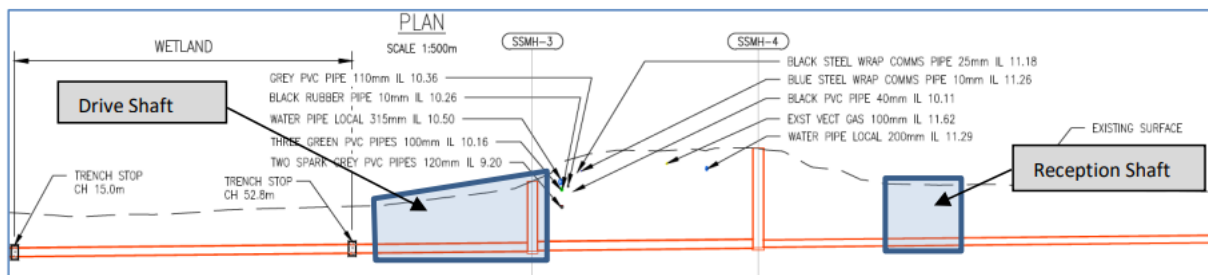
Indicative cross section of pipe hammering drive set up for the Brigham Creek Road works (Source: Brian Perry Civil)
